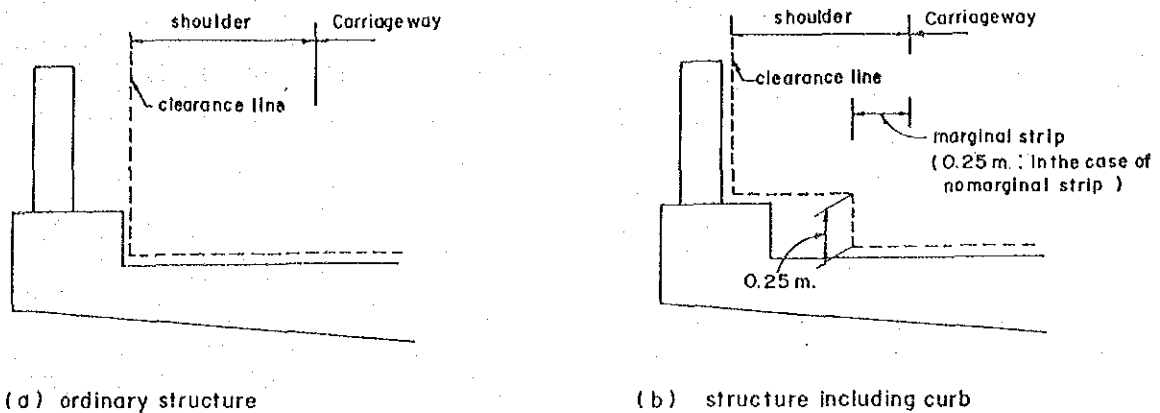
Structure of Shoulder for Bridge and Viaduct
